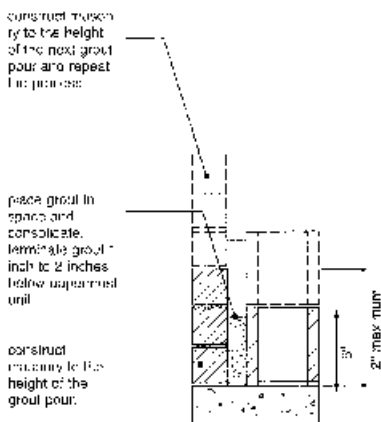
A: Grout pours 12 inch or less for multi-wythe wall
